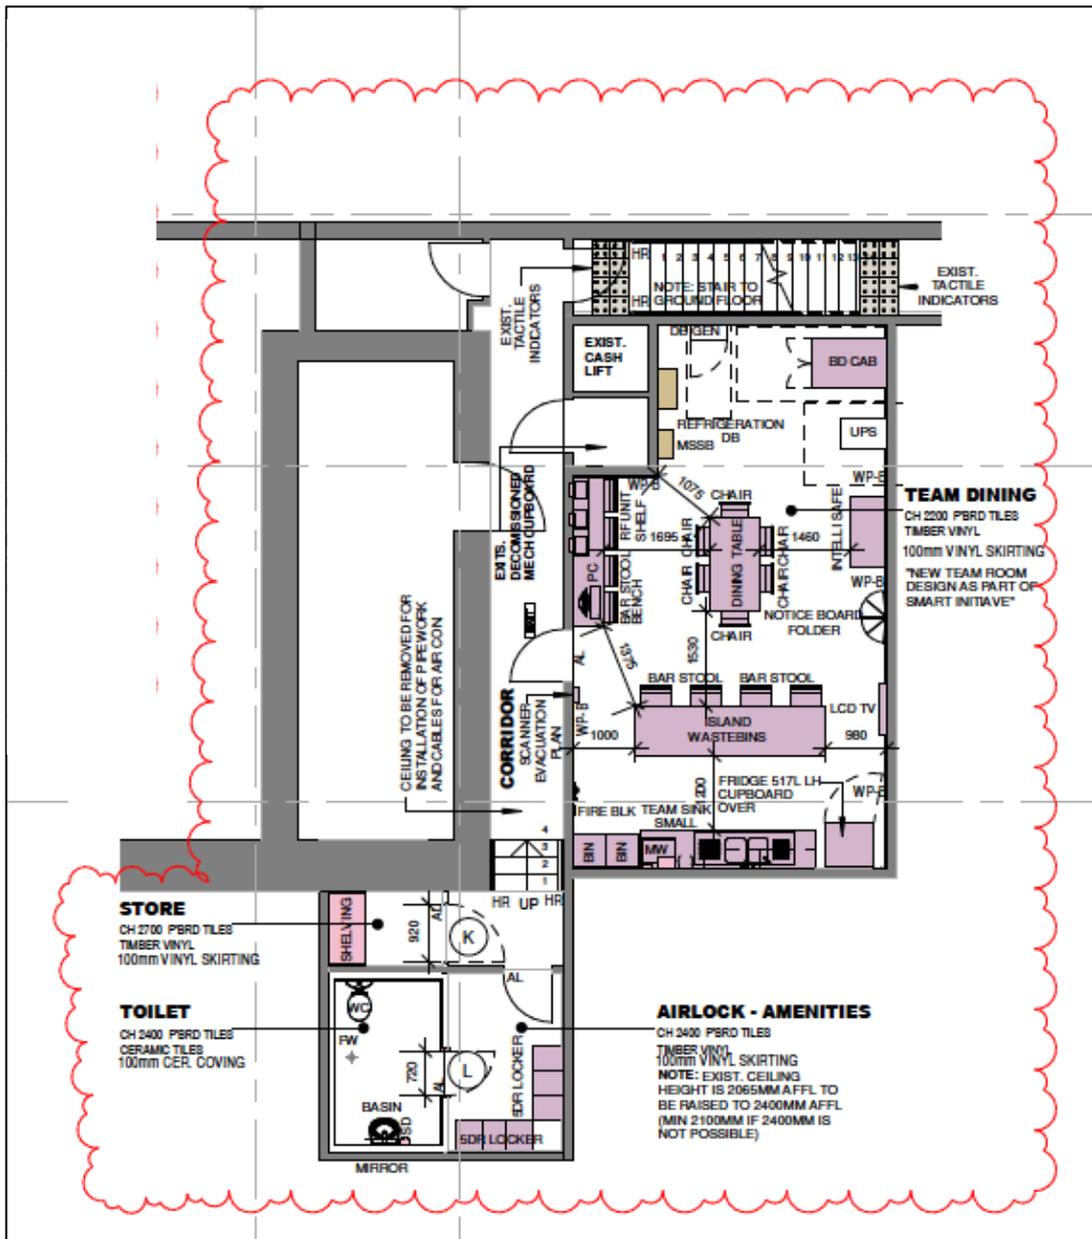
Proposed internal fit-out – Basement Plan (WA200)
